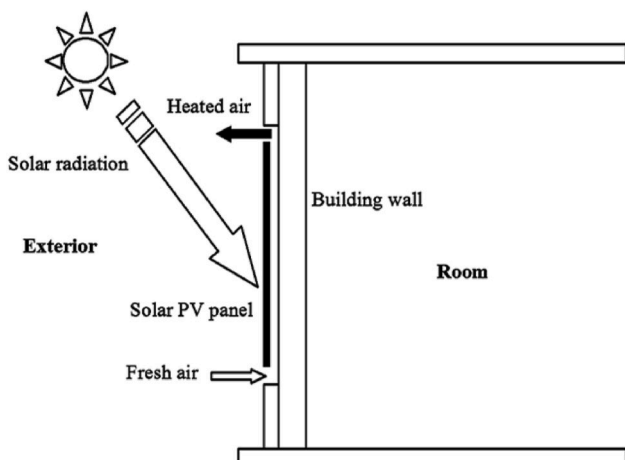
Scheme a photovoltaic Trombe wall [44].
